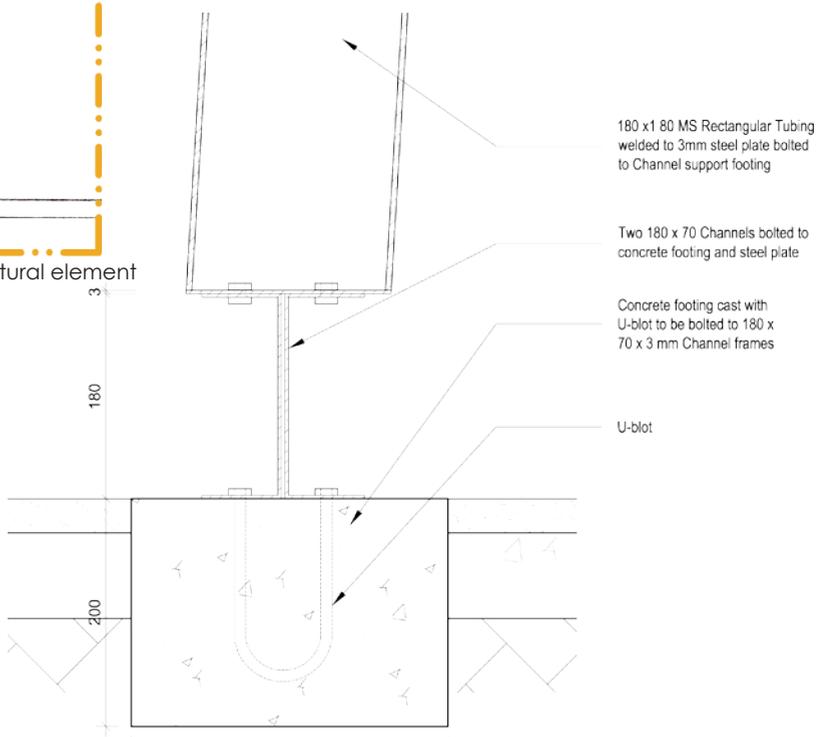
Detail for rectangular tubing fixed to ground surface
